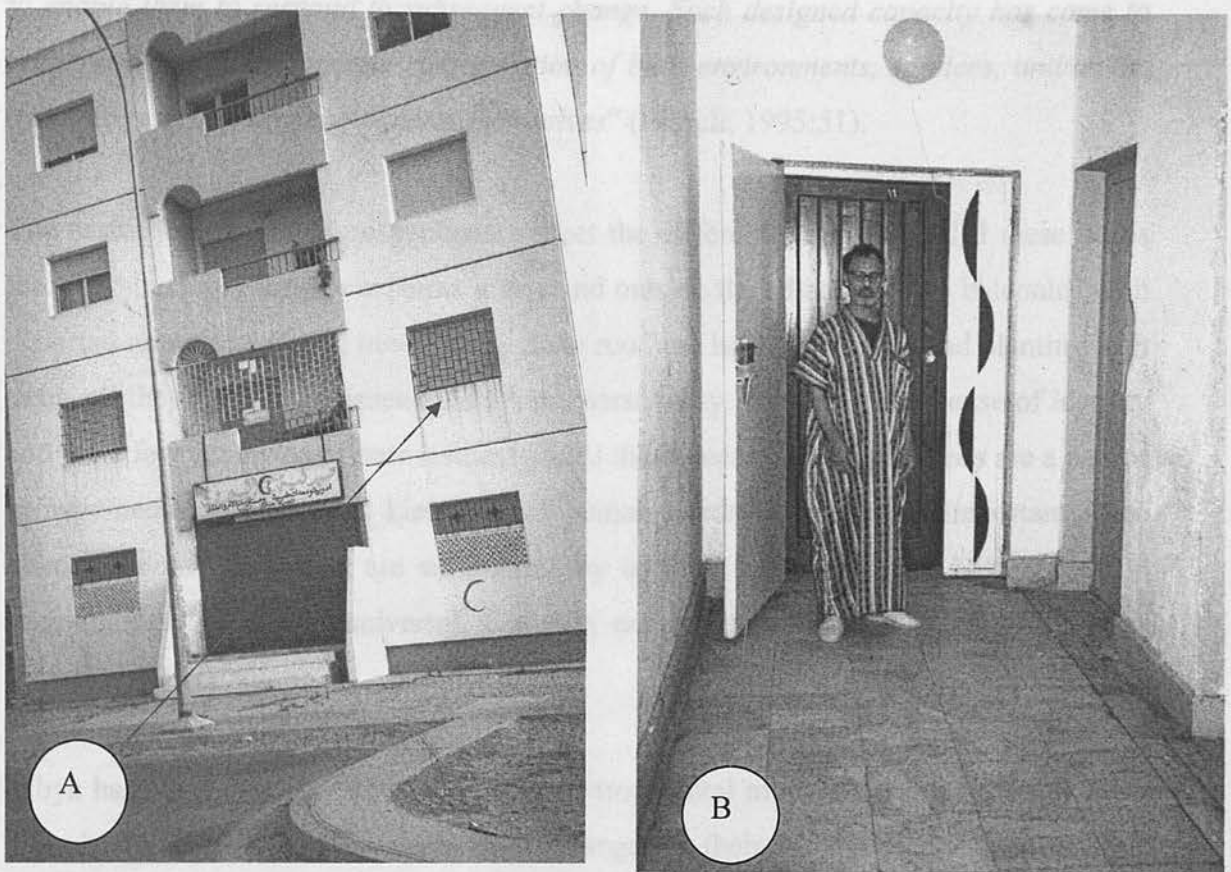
14 A – Adding steel net for windows, B- Adding steel main doors. (source: the author).
